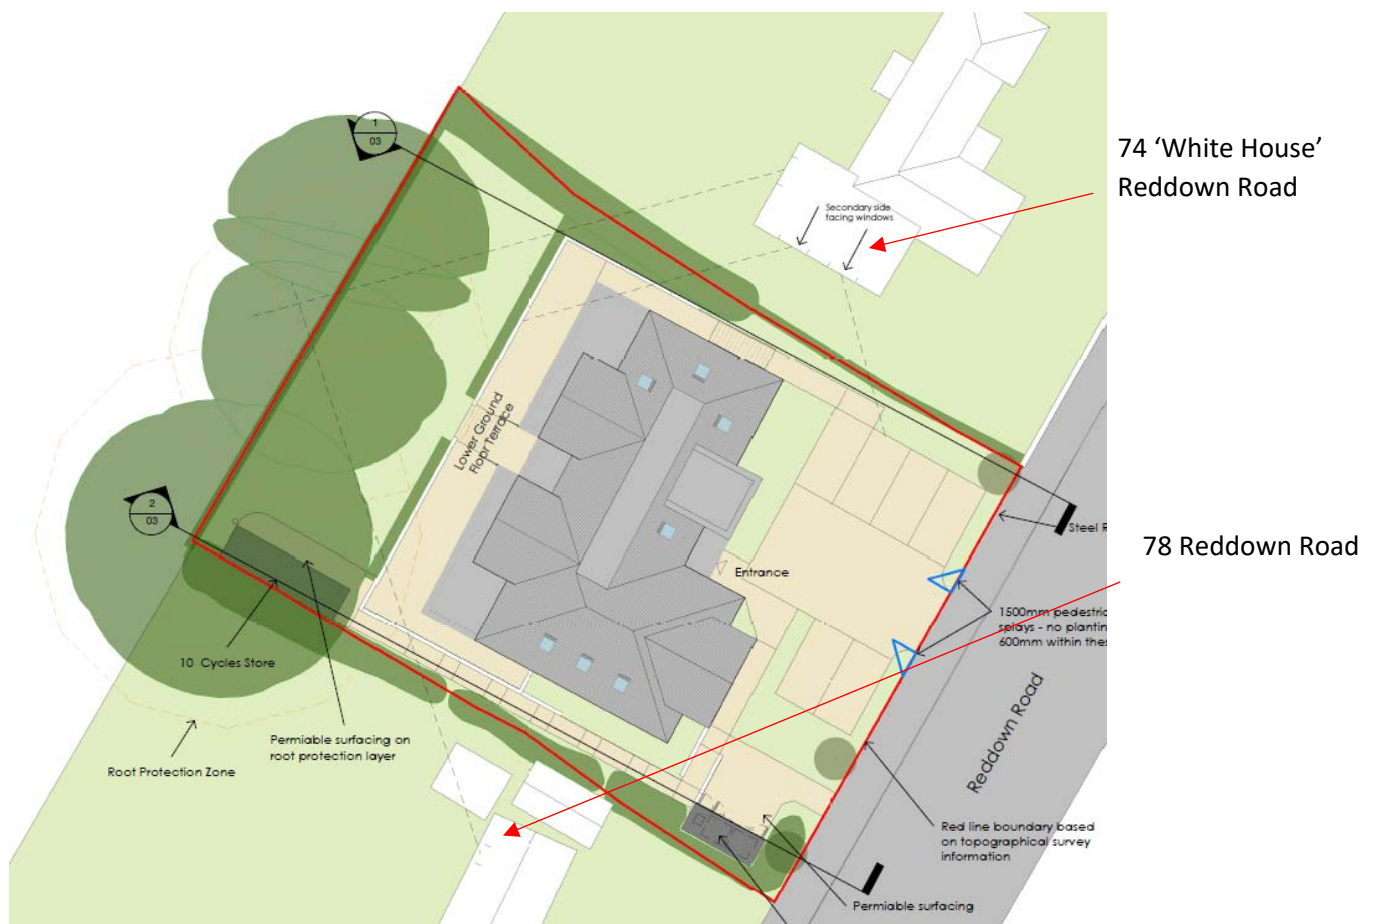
Site Plan highlighting the relationship with the adjoining occupiers.
